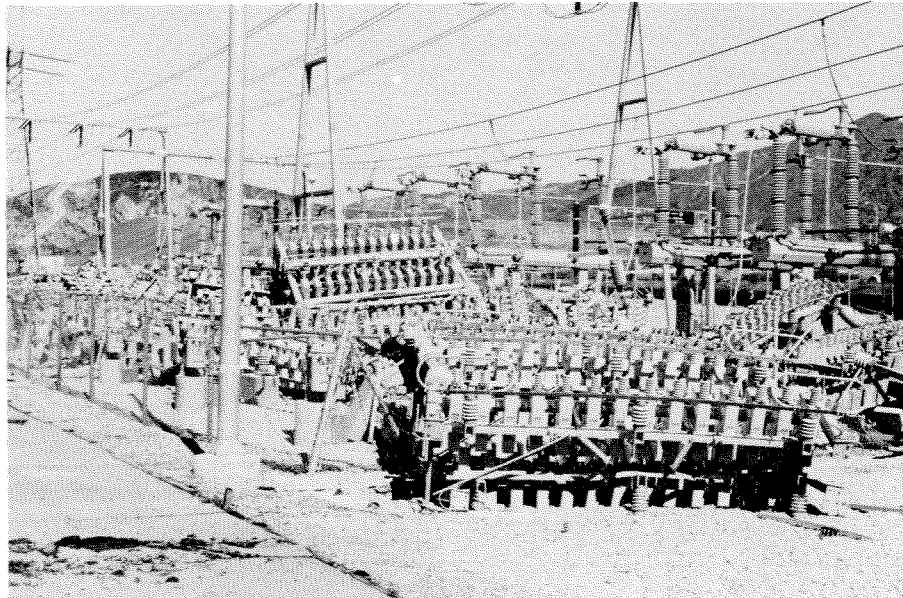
16 Damaged capacitor stacks in yard north of service and equipment building, Sylmar Converter Station.
